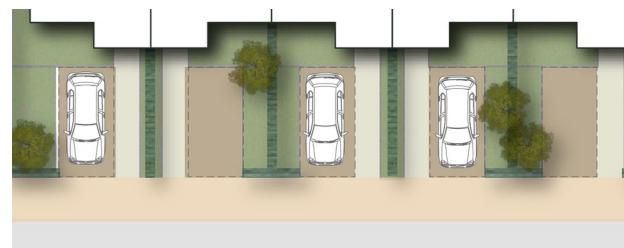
Illustrative diagram showing an indicative layout of on-plot front parking
